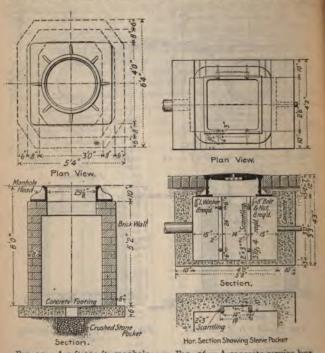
A 3 ft. ×4 ft. manhole. Fig. 76.—A concrete service box.
